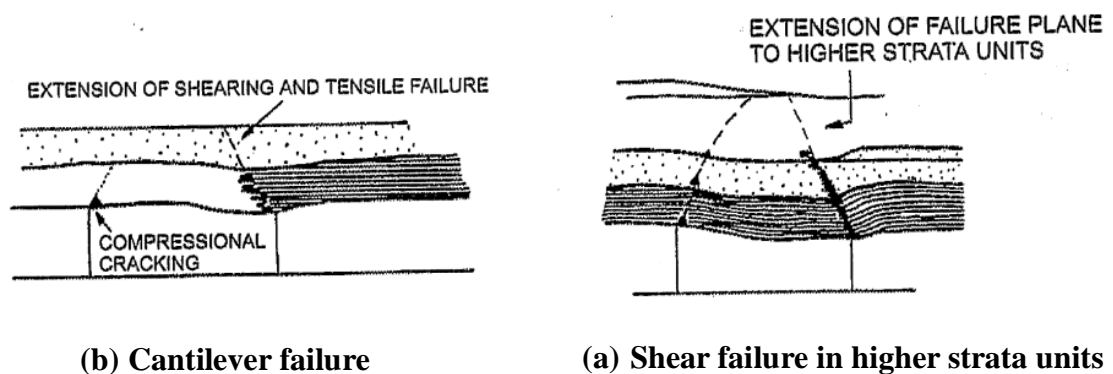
13 Cantilever Failure (Singh and Ghose 2006)
